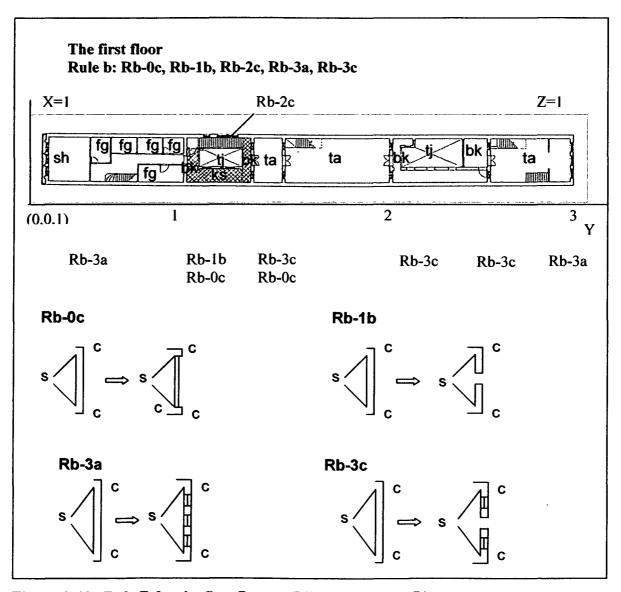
12 Rule B for the first floor at Dihwa Street No. 71
